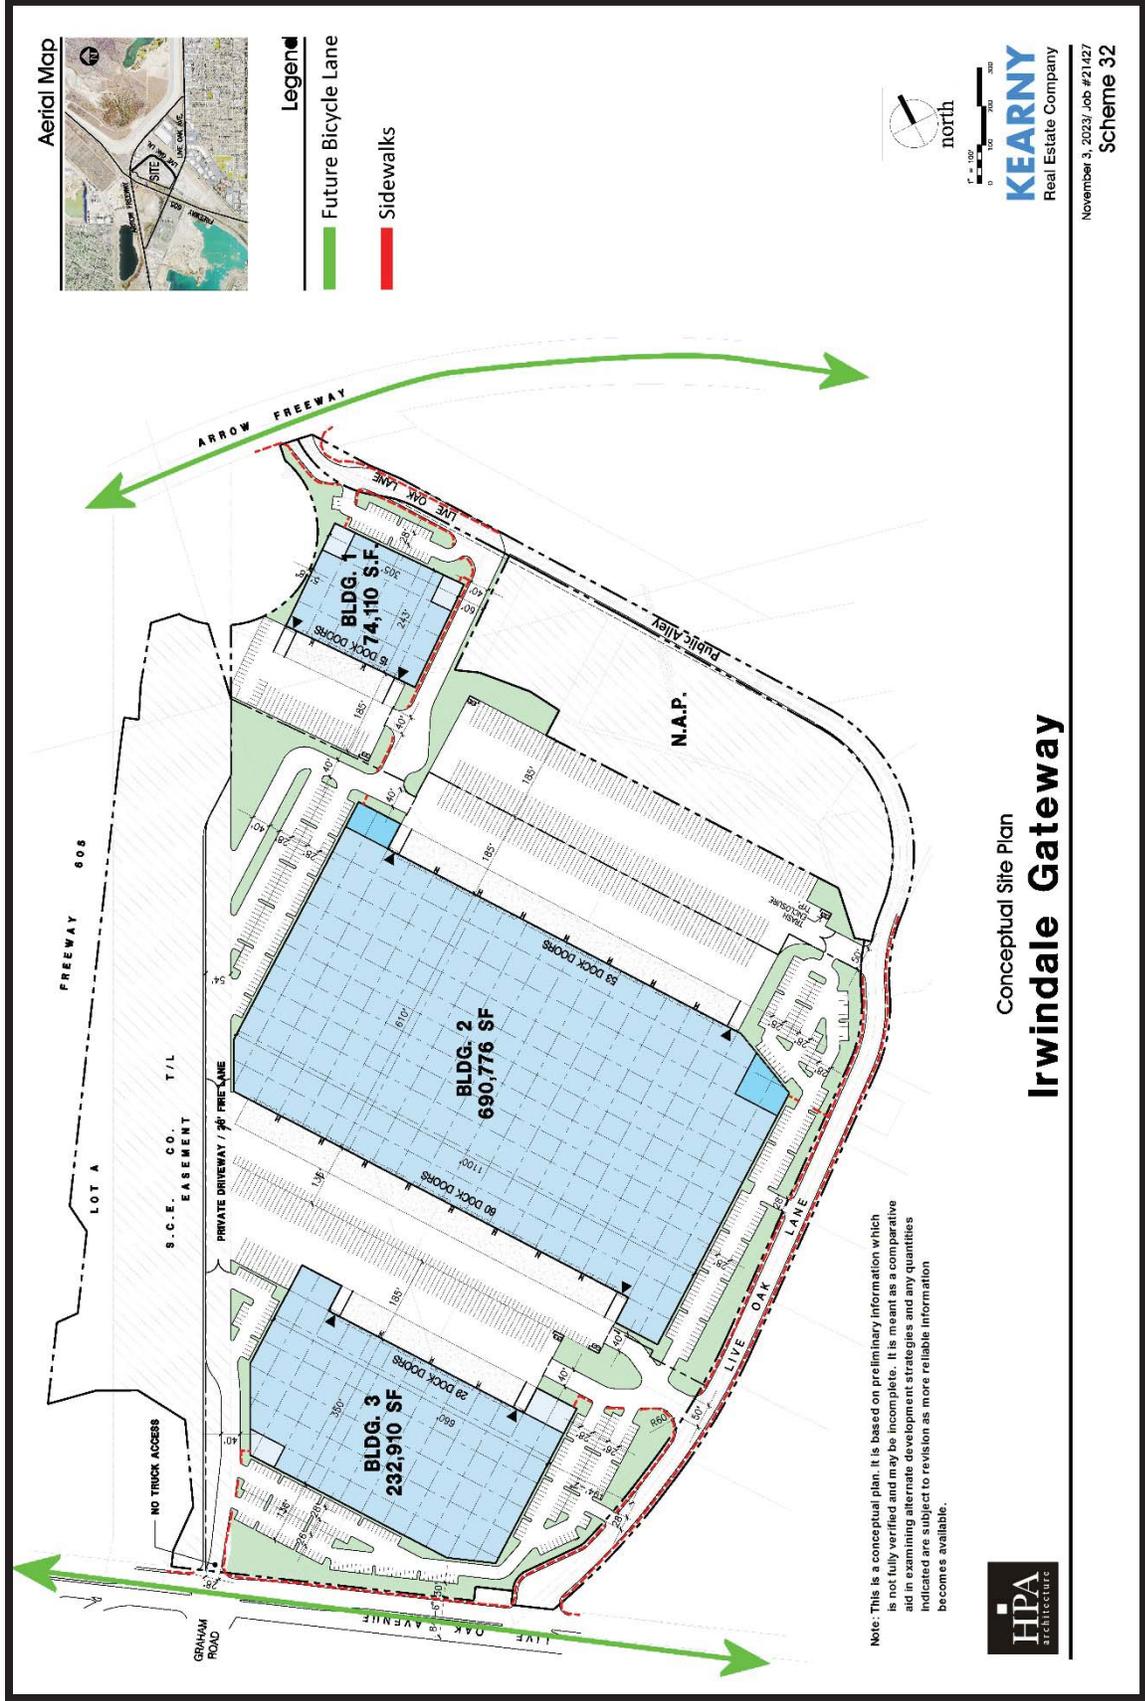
CONCEPTUAL NONVEHICULAR ACCESS PLAN WITHOUT BESS
